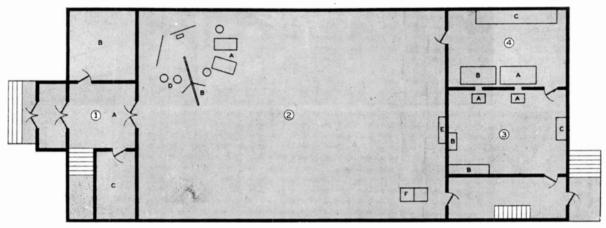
PLAN OF THE GROUND FLOOR, OCCUPIED BY THE OFFICES, STUDIO, PROJECTION ROOM, AND SHOP
